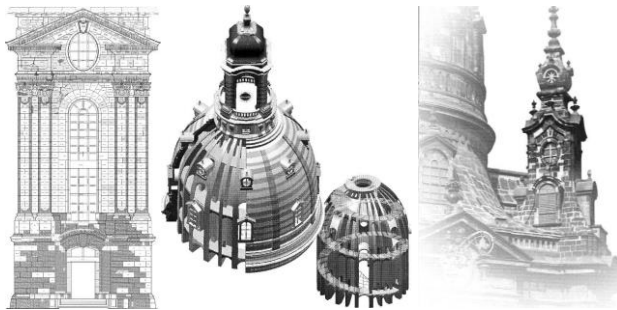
Reconstruction of Church Facades & Combination between Old and New Stones [10].
